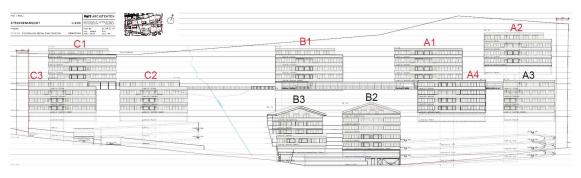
Layout Plan Building Park Ennetbürgen (Unit Architekten)
